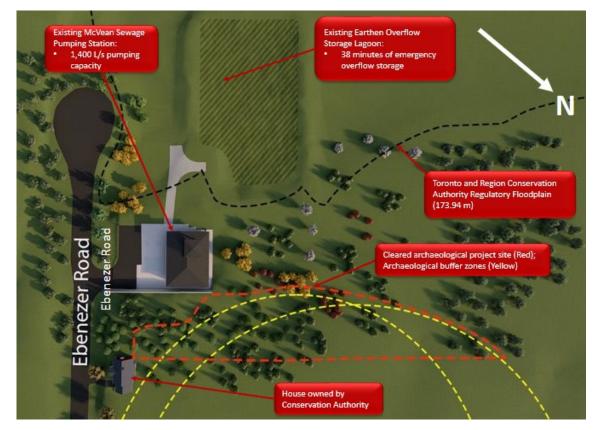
McVean Sewage Pumping Station, Emergency Overflow Lagoon and Surrounding Area
